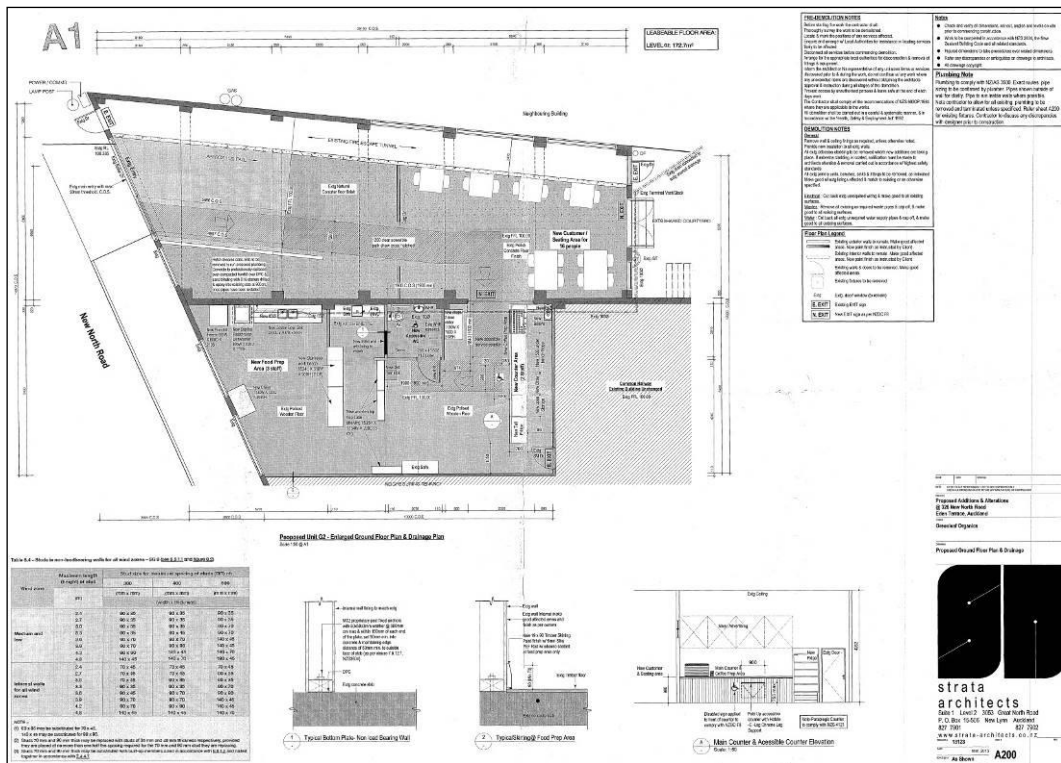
2015 Drawings for 'Proposed Additions and Alterations @ 326 New North Road' for Greenleaf Organics [Café] - by Strata Architects: Proposed Ground Floor Plan and Drainage. Auckland Council Filenet. Accessed October 2016.
